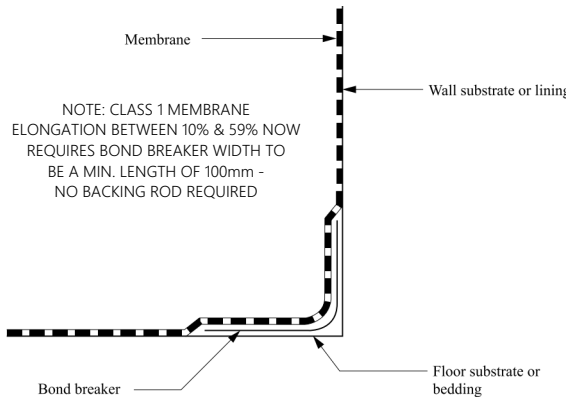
TYPICAL BOND BREAKER DETAIL
